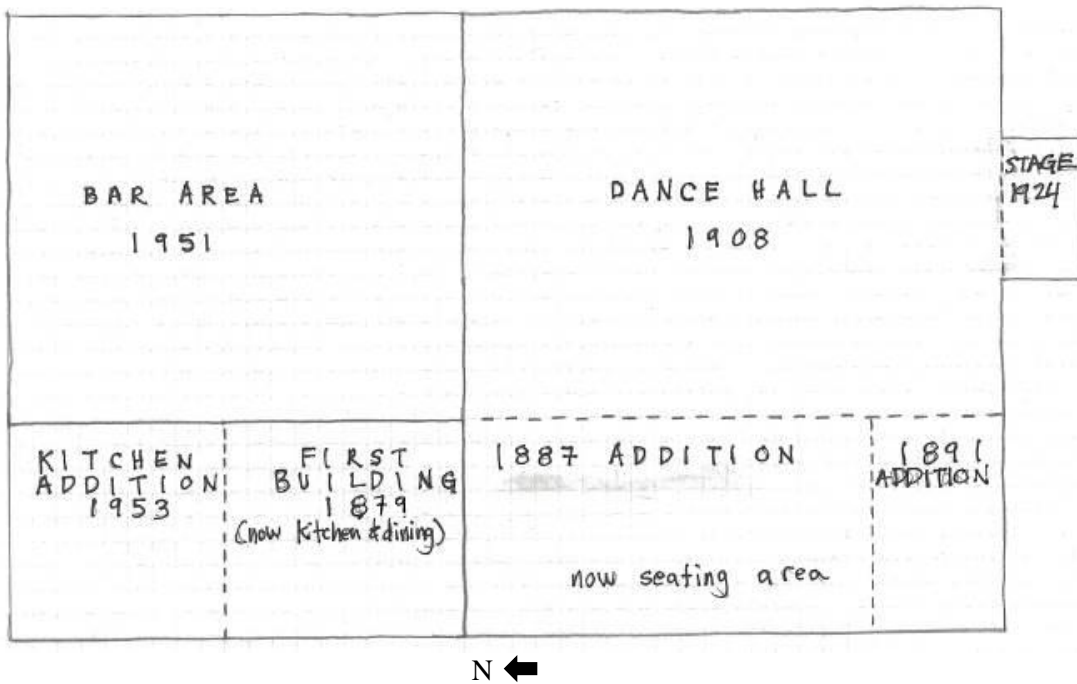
Rough sketch of the floor plan Anhalt Hall with dates of construction. Source: HHM.
